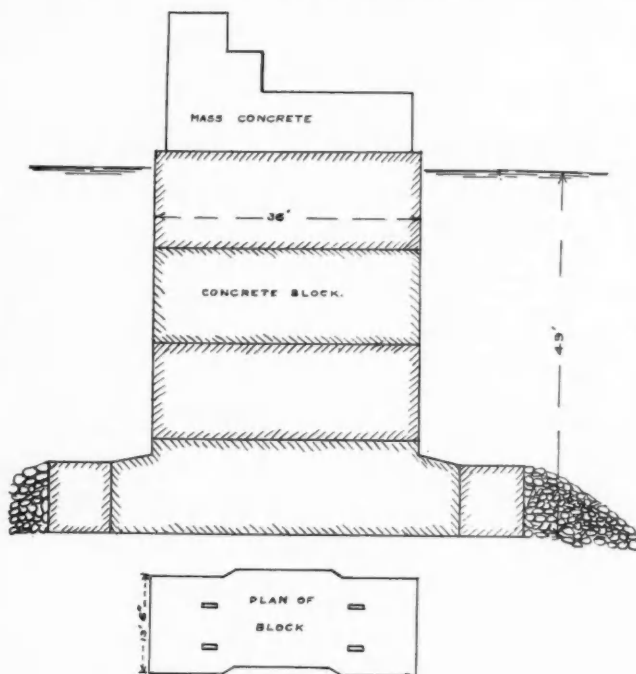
Breakwater built of 400-ton Concrete Blocks.
